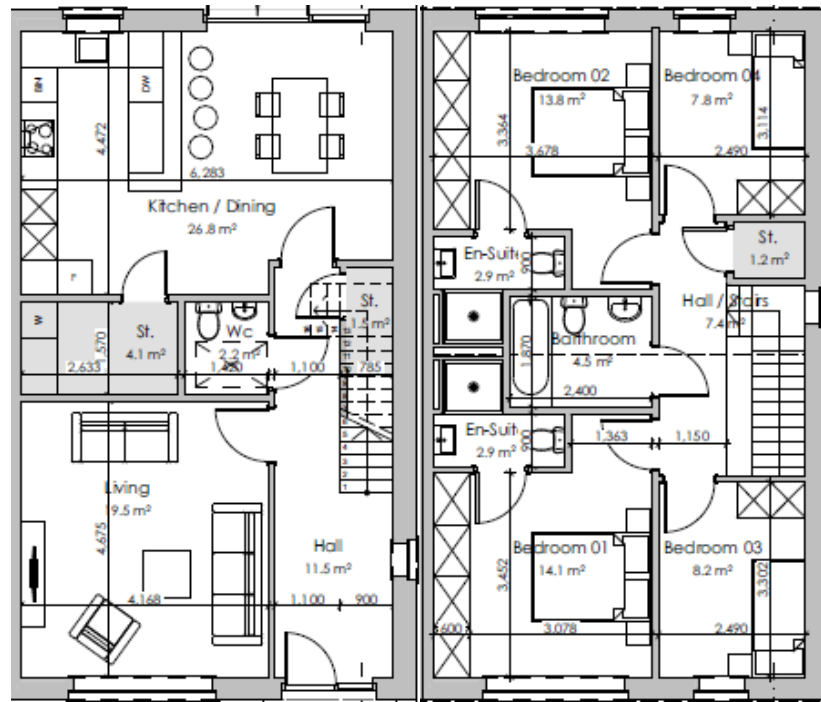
Ground (l) and first (r) floor plans of House Type 4.1.
